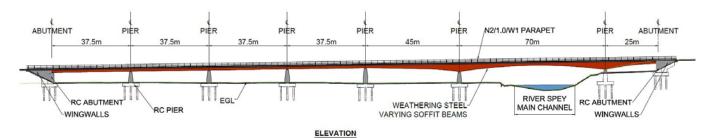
Spey Crossing Indicative Structure Cross-Section
